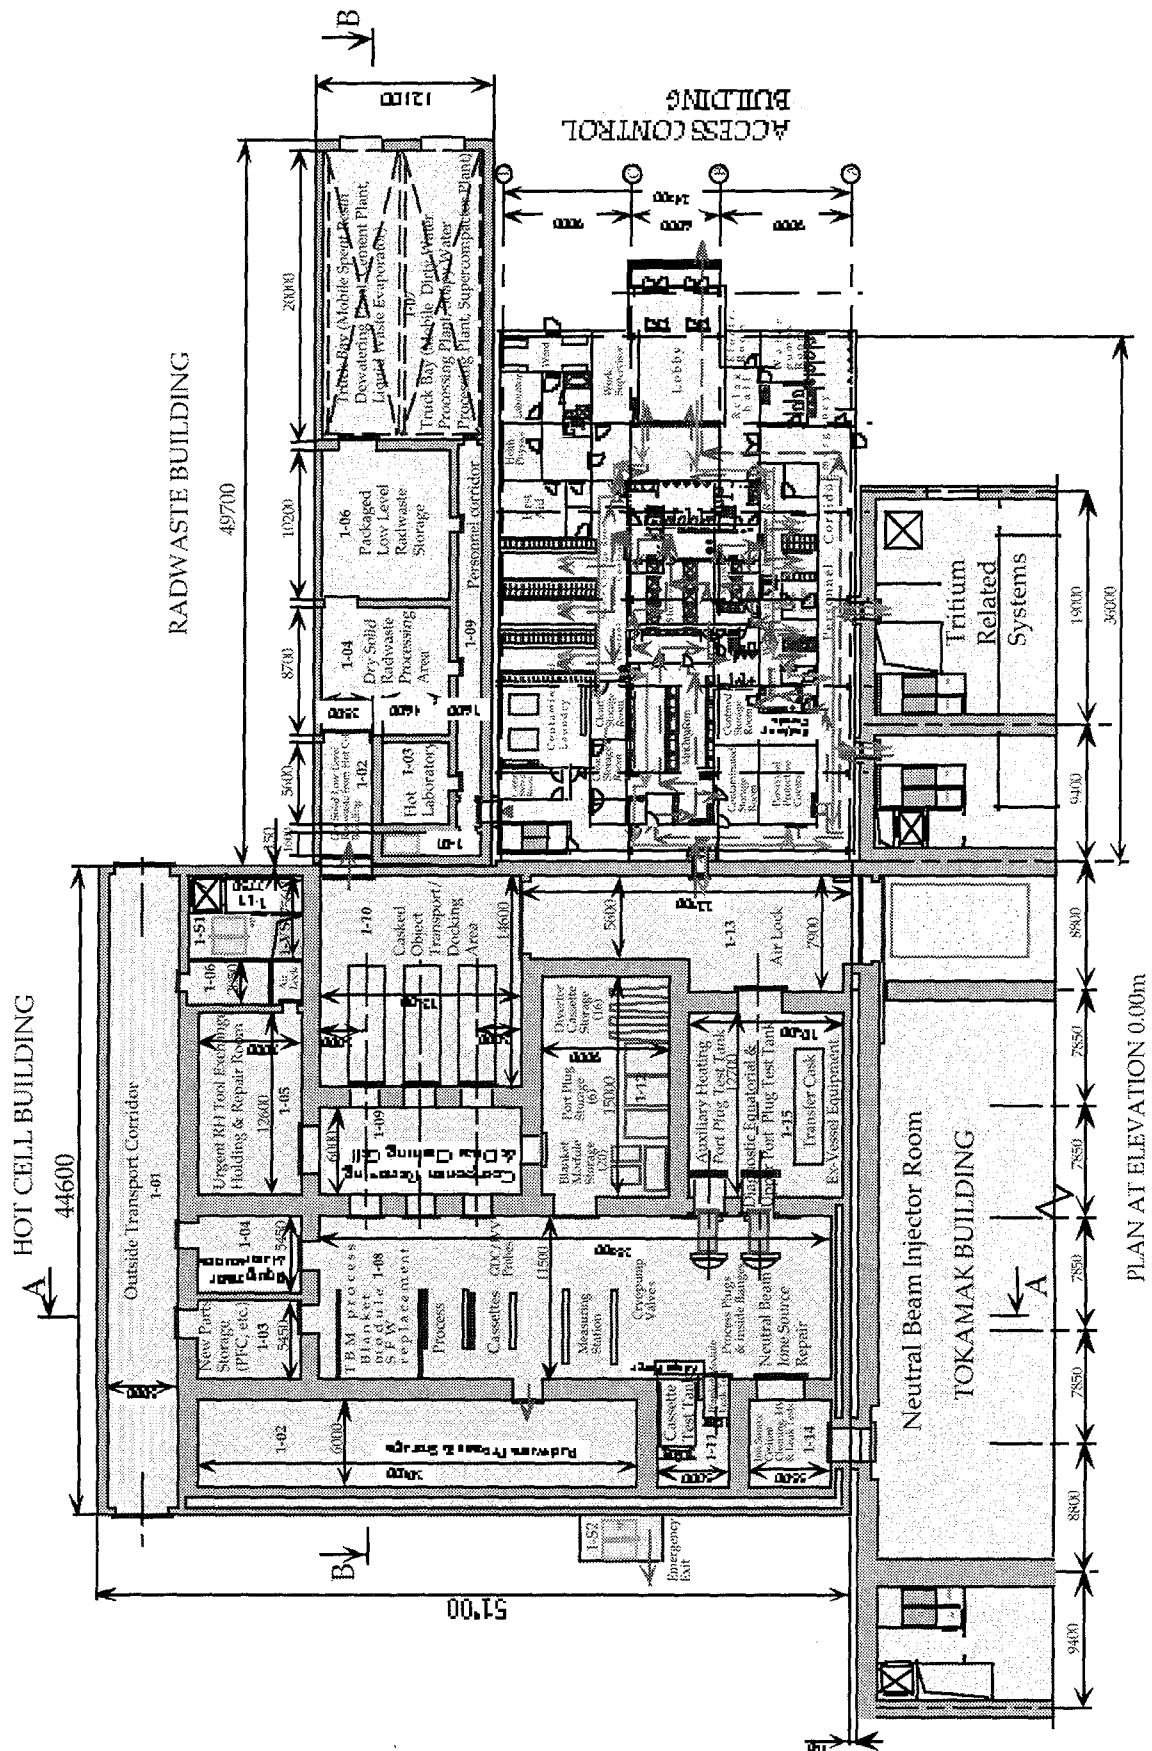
Hot Cell Building Ground Floor Plan
